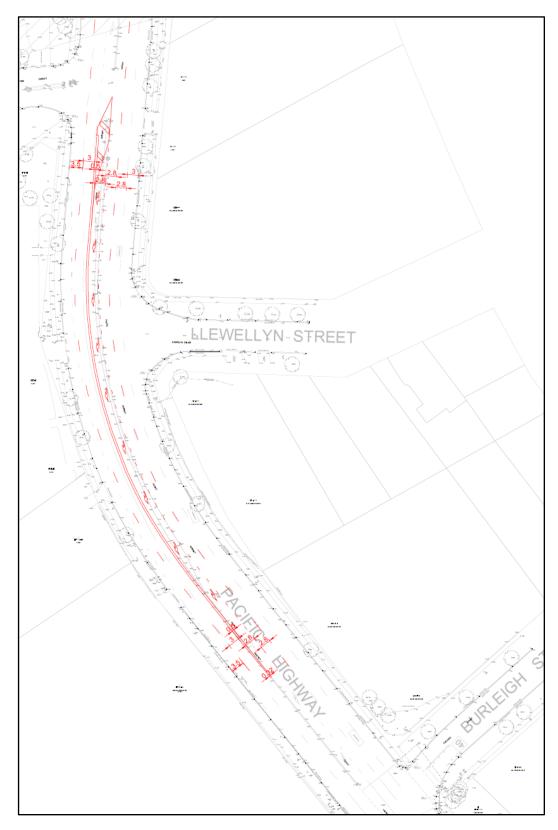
Potential right turn bay extension to Gladstone Parade for full 170m
